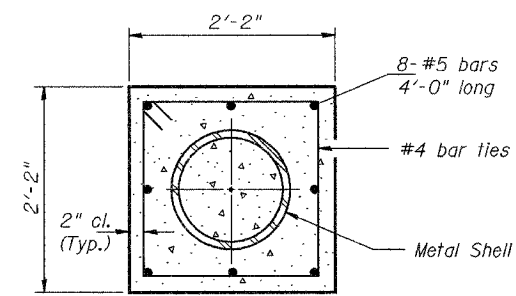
DETAIL OF REINFORCEMENT FOR METAL SHELLS AT ABUTMENTS
